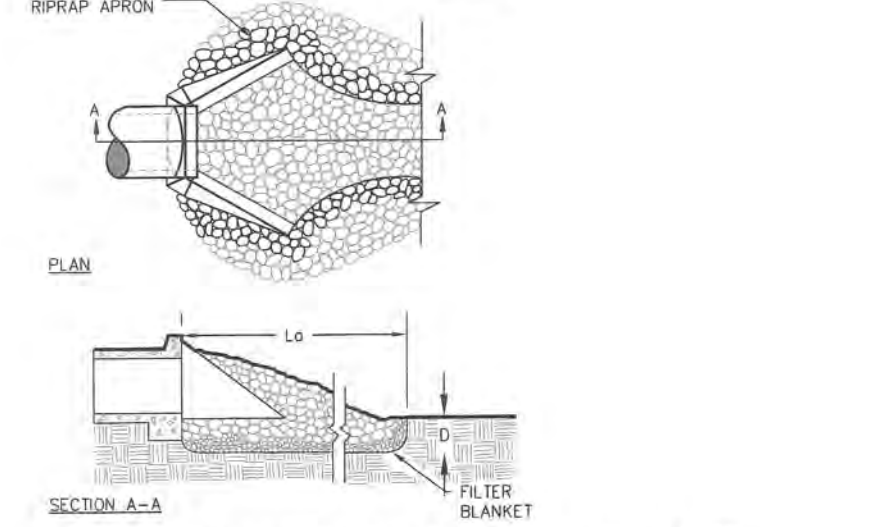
Riprap Outlet Protection (Modified From Va SWCC)
